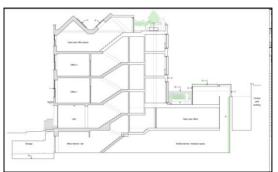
Proposed section of the permitted infill extension at no.14 Great James Street.
